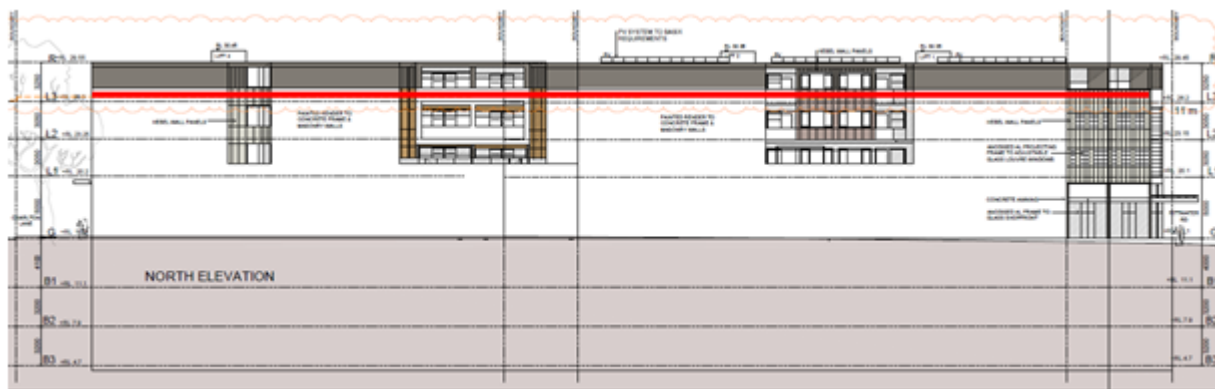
Plan extract showing extent of 11 metre building height breach northern facade
